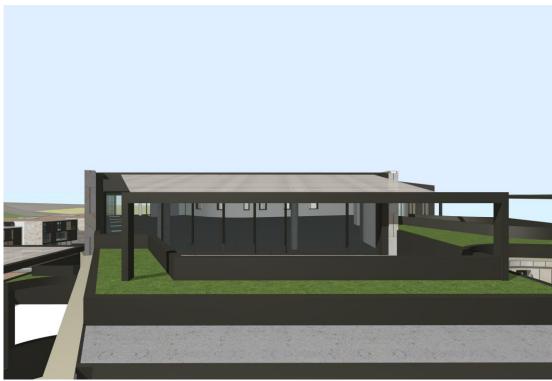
Building E with proposed awning on Level 4, S side. Awning fully extended.
